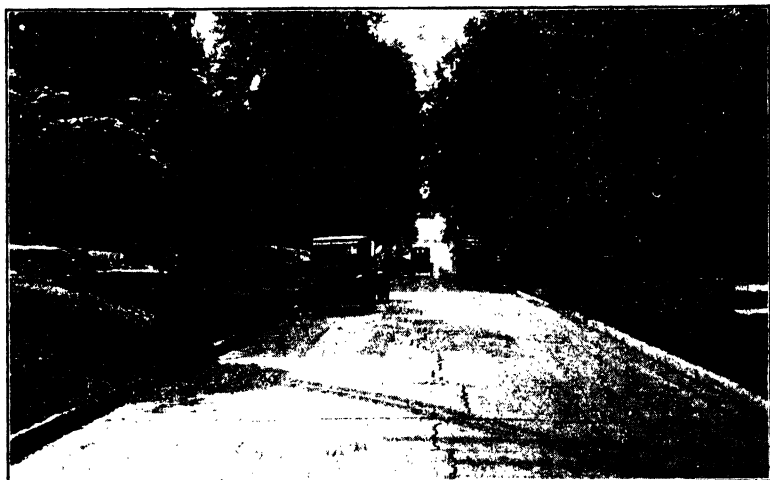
A shady street but the trees are too close together to develop properly. Note the cracks in the grouted brick pavement.
